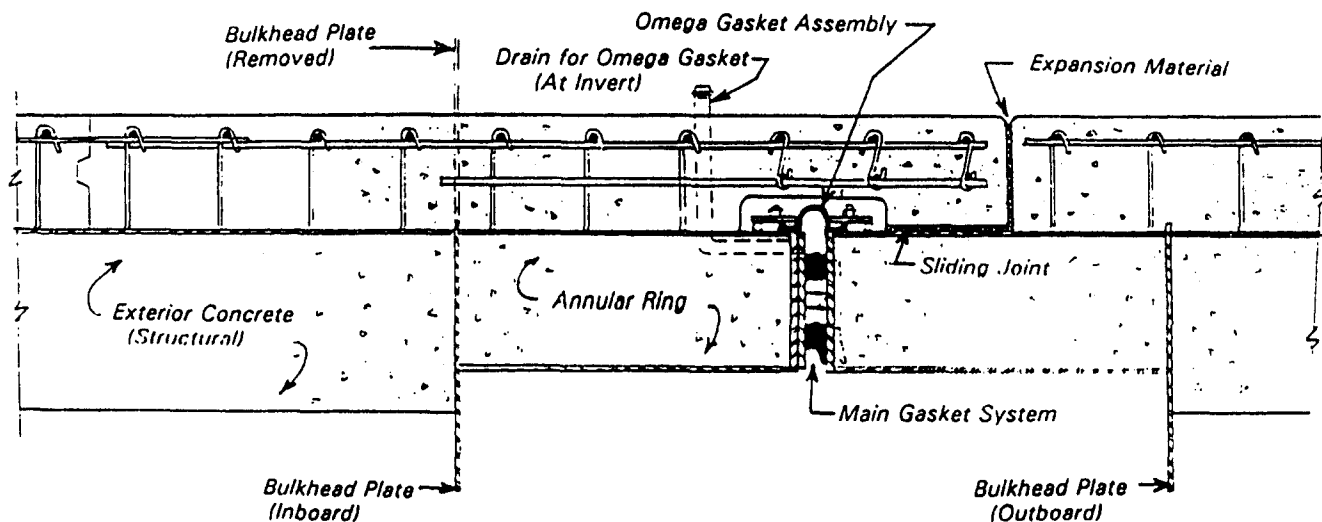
Typical joint detail for Boston's Third Harbor Tunnel.
